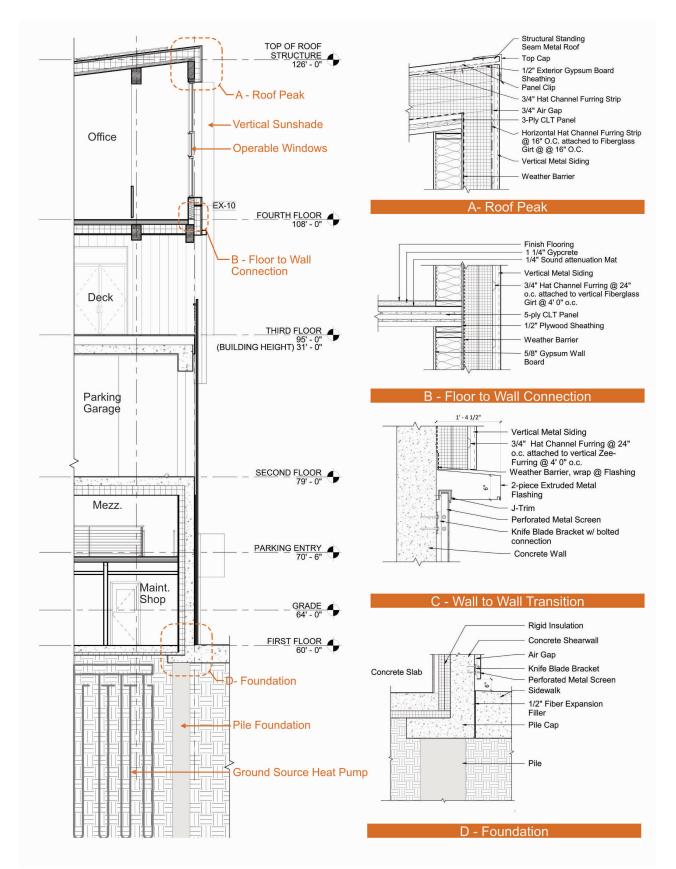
MIXED-USE INDUSTRIAL WALL SECTION & DETAILS (TYPICAL CONDITIONS)
